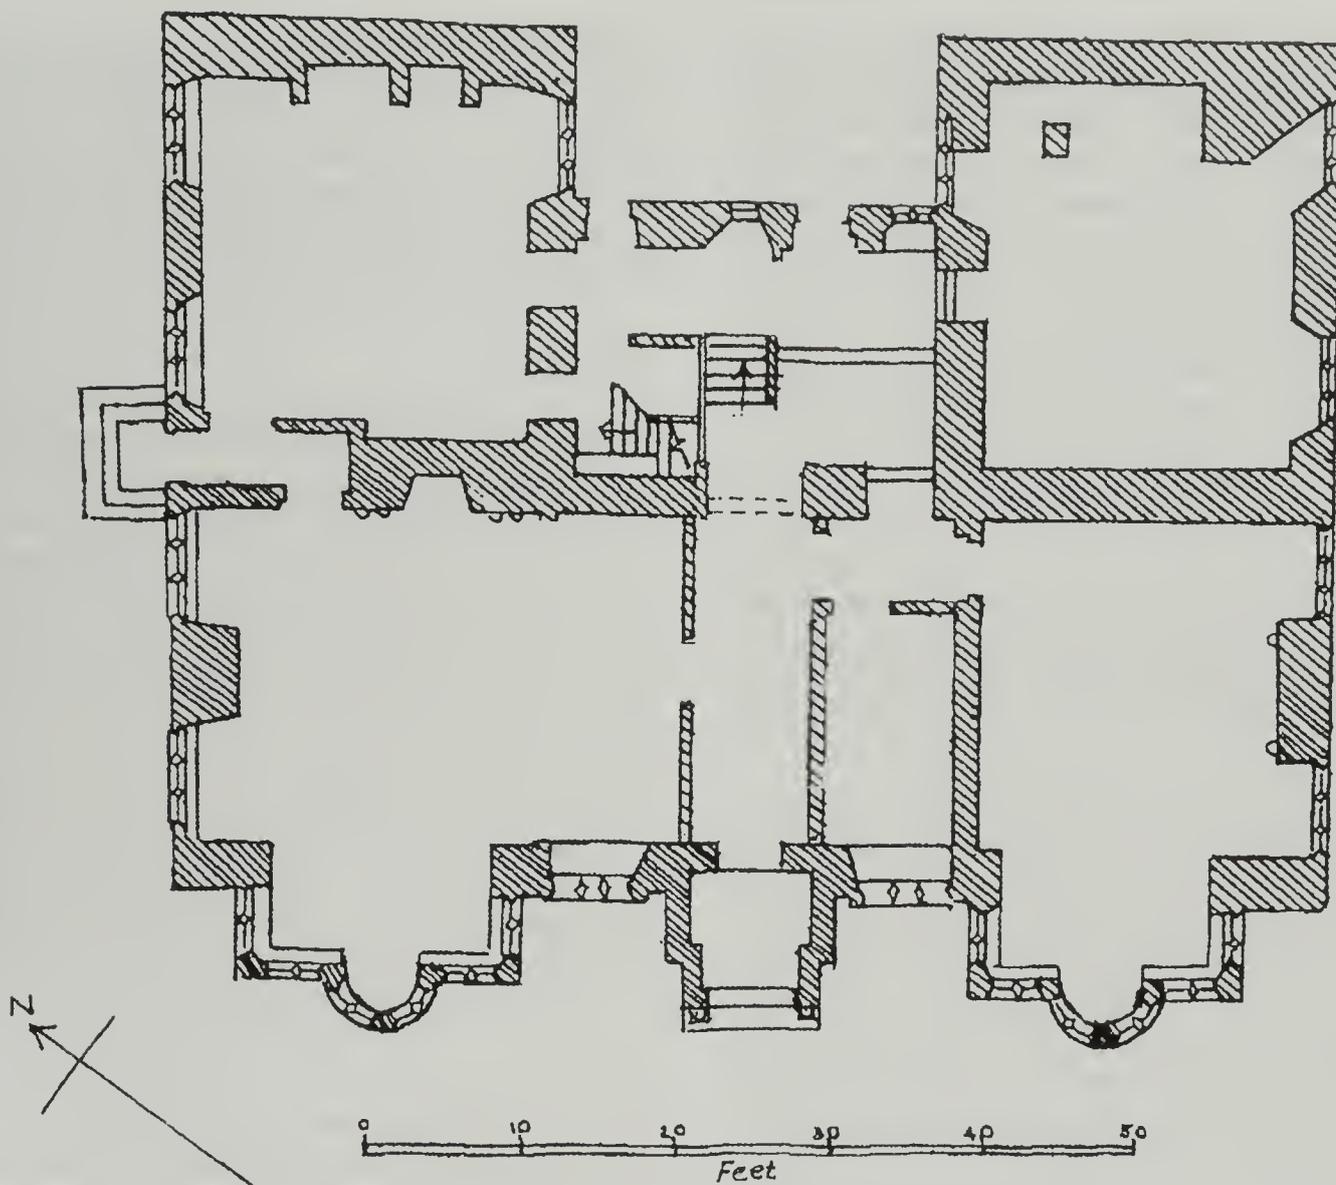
Reconstructed ground floor plan by Alison Maguire
